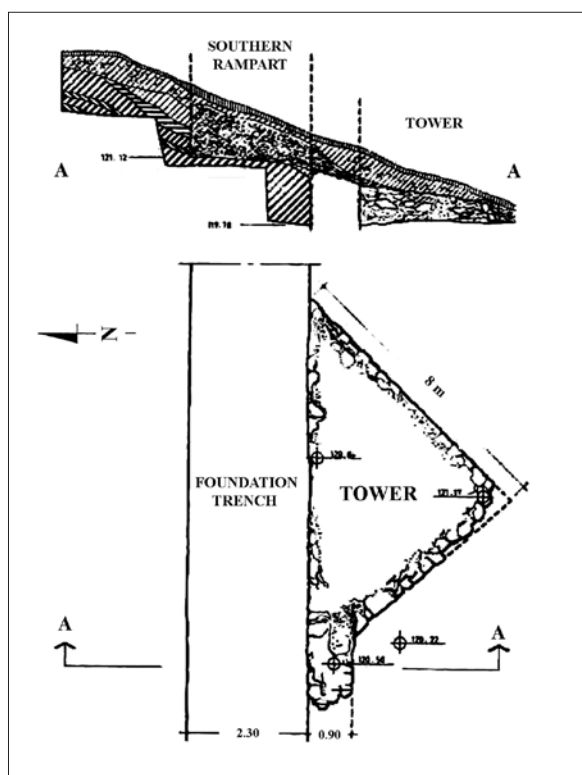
Braničevo, Veliki Grad, remains of a tower on the southern rampart, plan with elevation and section (Поповић, Иванишевић 1988: 132)
